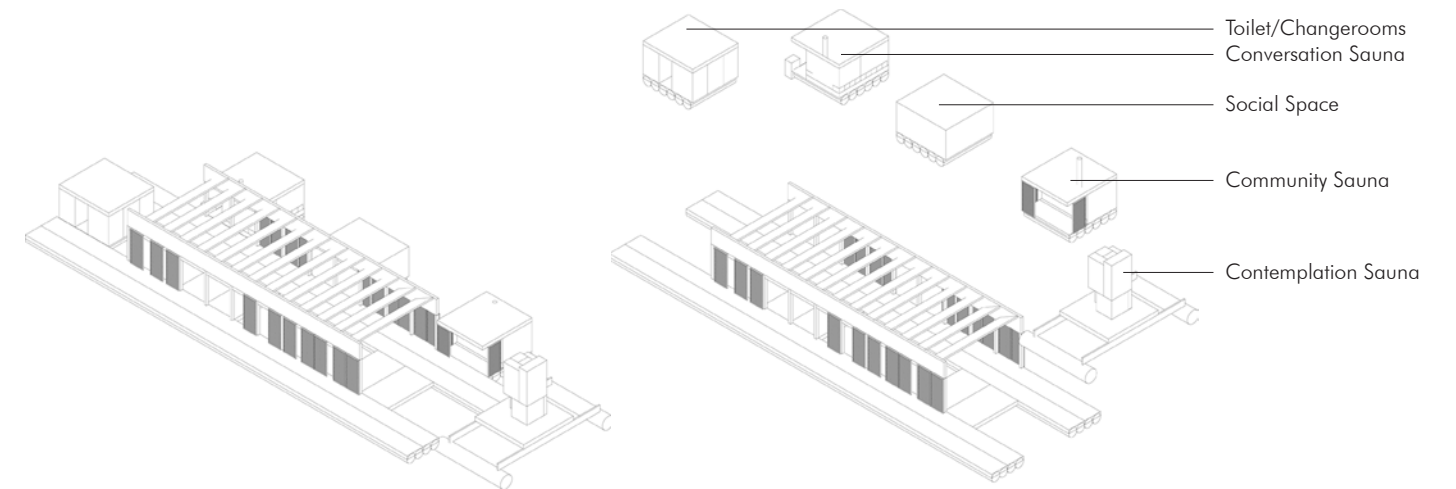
(left) Axonometric program drawing of the collective sauna. (right) Exploded axonometric program drawing. Drawing by author.
